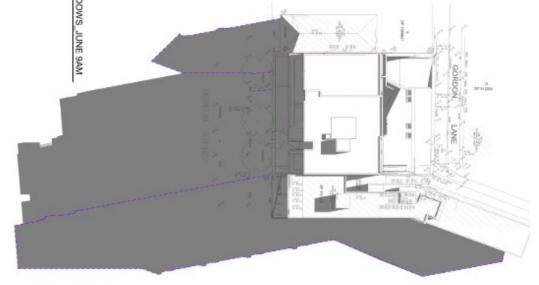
Submitted shadow diagram for proposed development at no. 21-25 Gordon Street at 9am on June 21. Even if principal living areas were located at the front of the properties across Gordon Street, the front elevations would receive direct solar access between 12 and 3pm on June 21.
